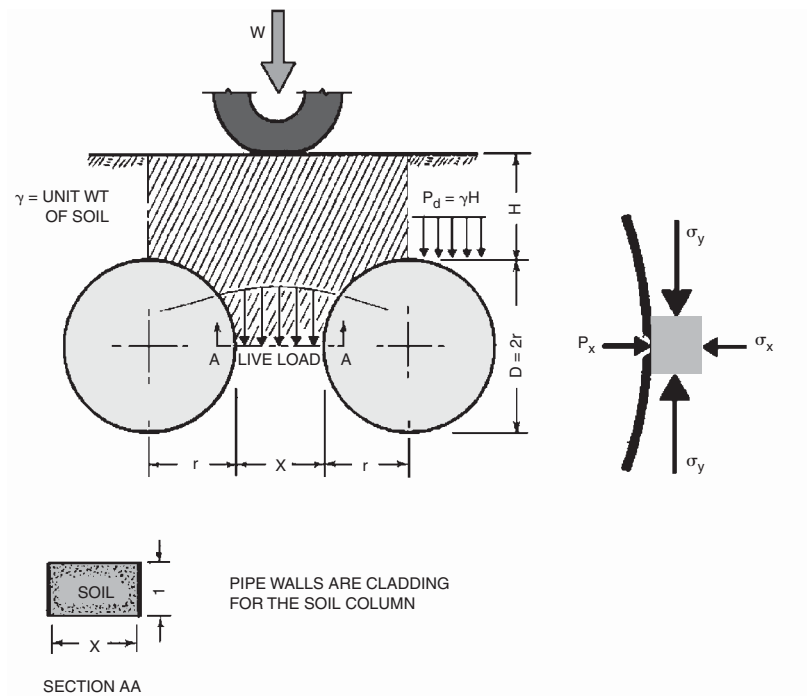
Soil column between parallel pipes showing minimum section AA. This section must be able to resist the entire live load plus part of the dead load.
